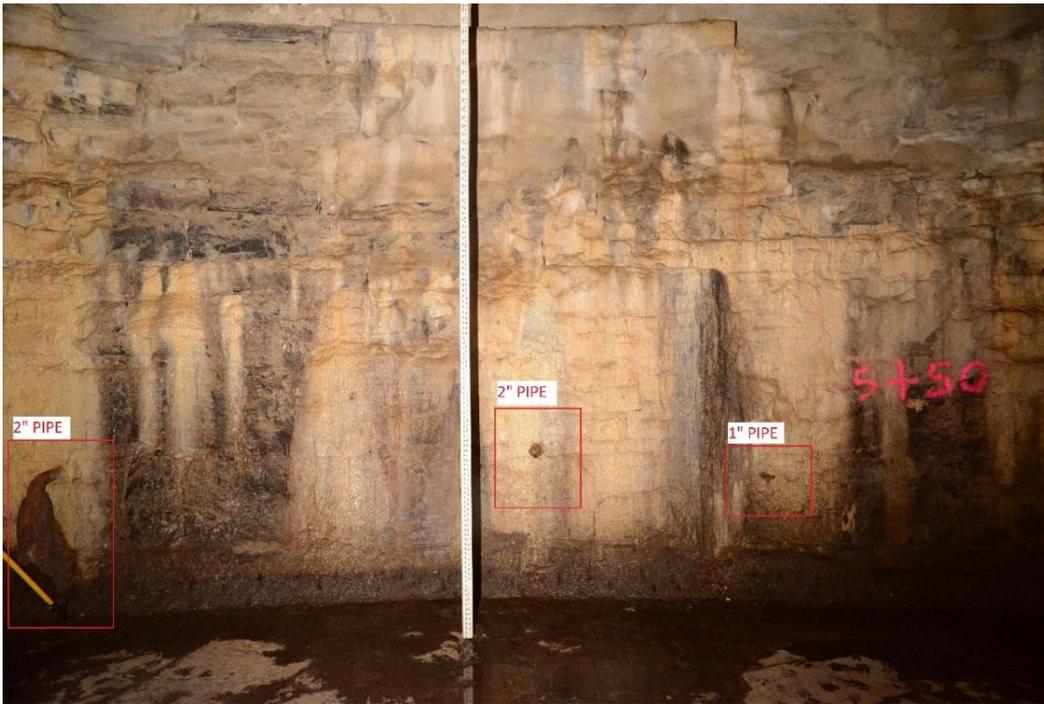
Groundwater pipes on inland wall at 90-degree bend. Photograph by CNA Engineers, Inc., January 2014.
